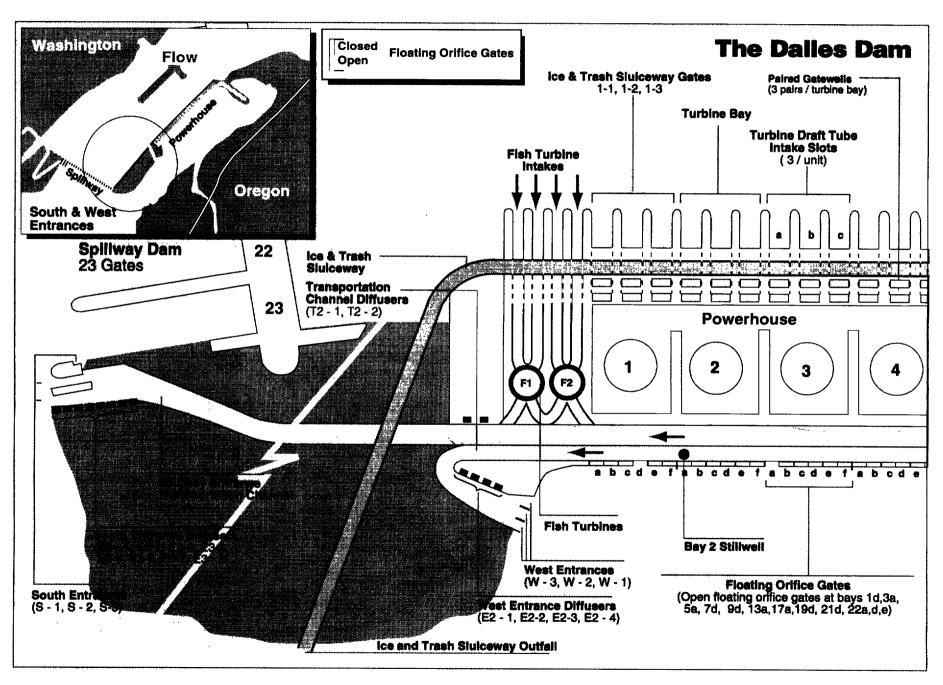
The Dalles Dam South and West Fish Ladder Entrances
